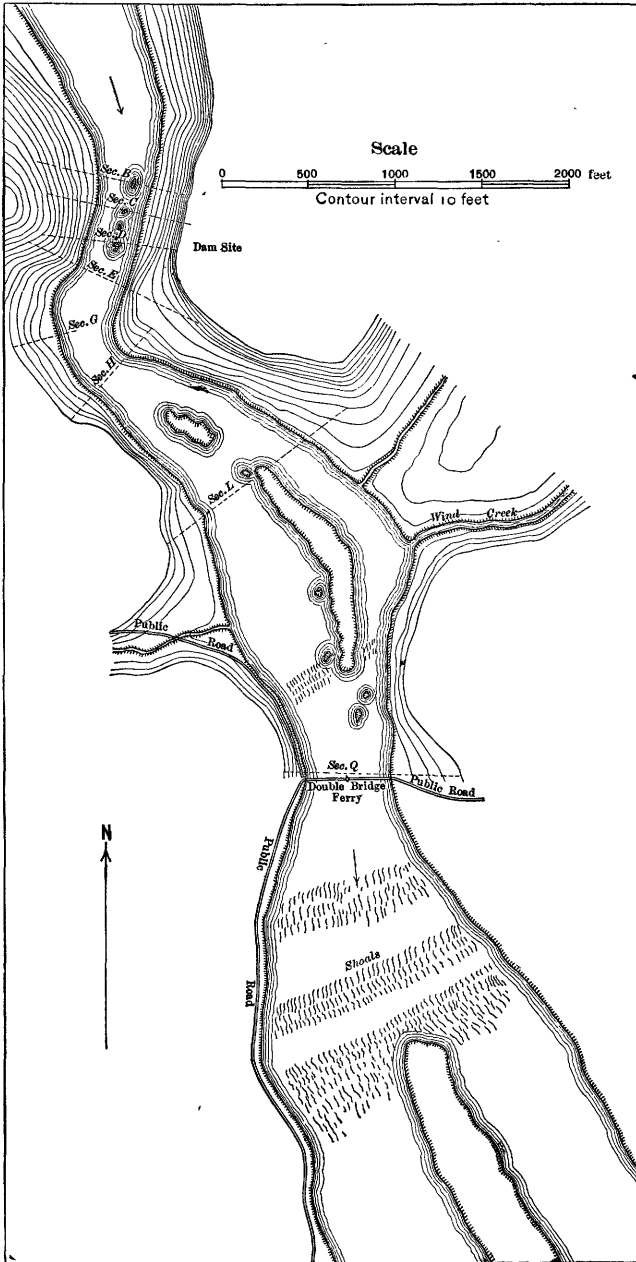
Topographic plan and location of cross sections of Tallapoosa River at Cherokee dam site.
